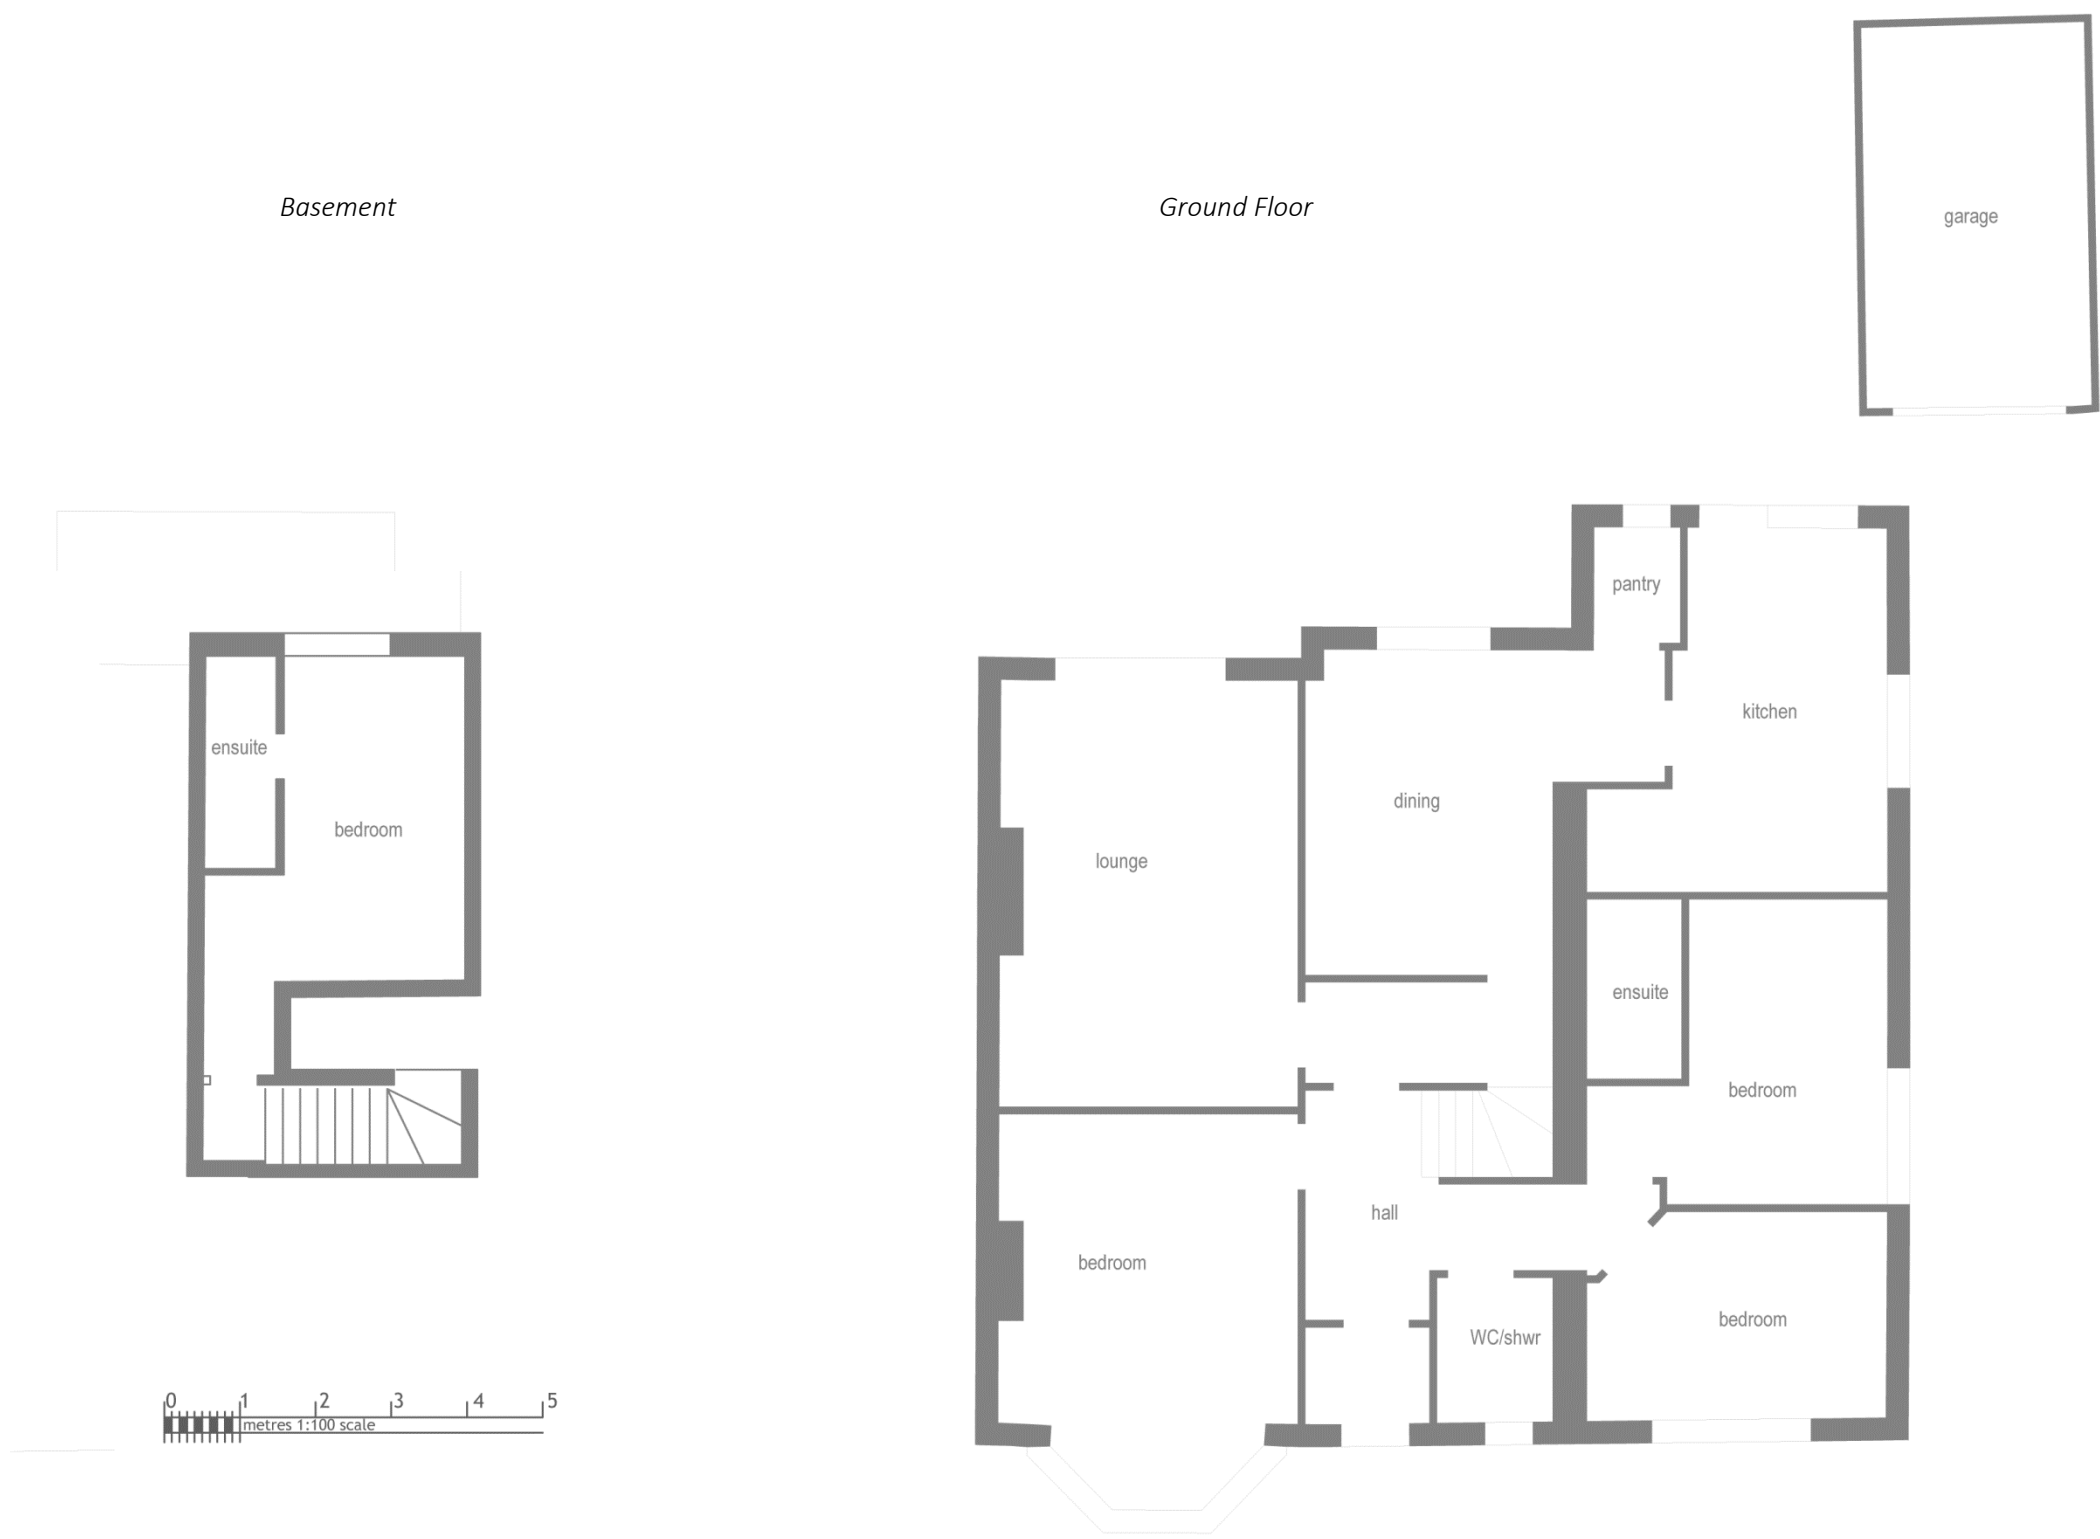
Existing basement and ground floor plans (scale as shown: 1:100 @ A3)
